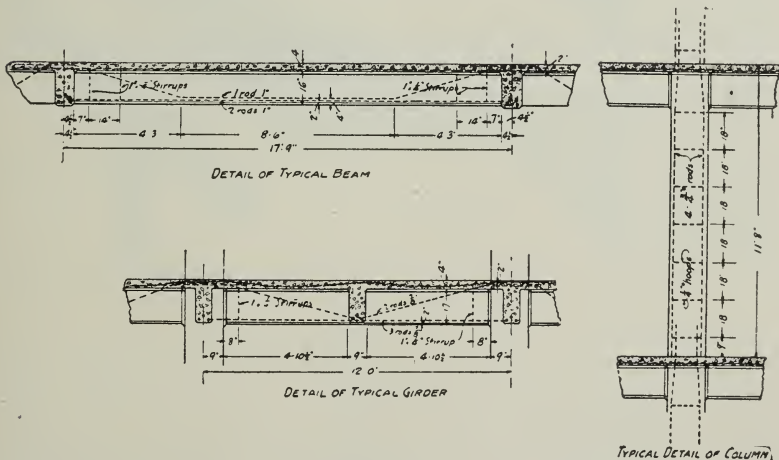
Beam, Girder and Column Details, Storage Warehouse, Lynn, Mass.
